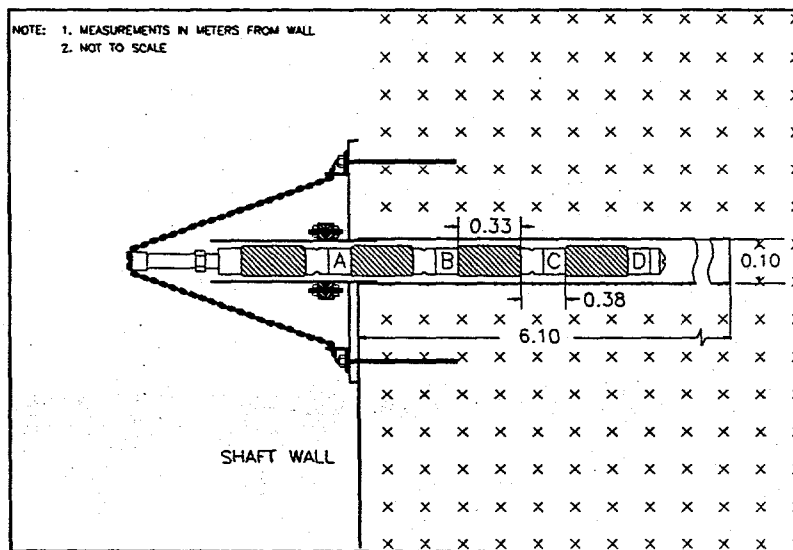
Typical Gas-Permeability Multi-Packer Test Tool Installation Showing Standard Packer and Interval Dimensions
